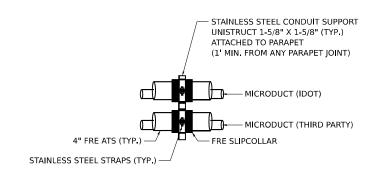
### DETAIL E CONDUIT ATS AT LIGHT POLE DETAIL (EB SHOWN, WB SIMILAR)
